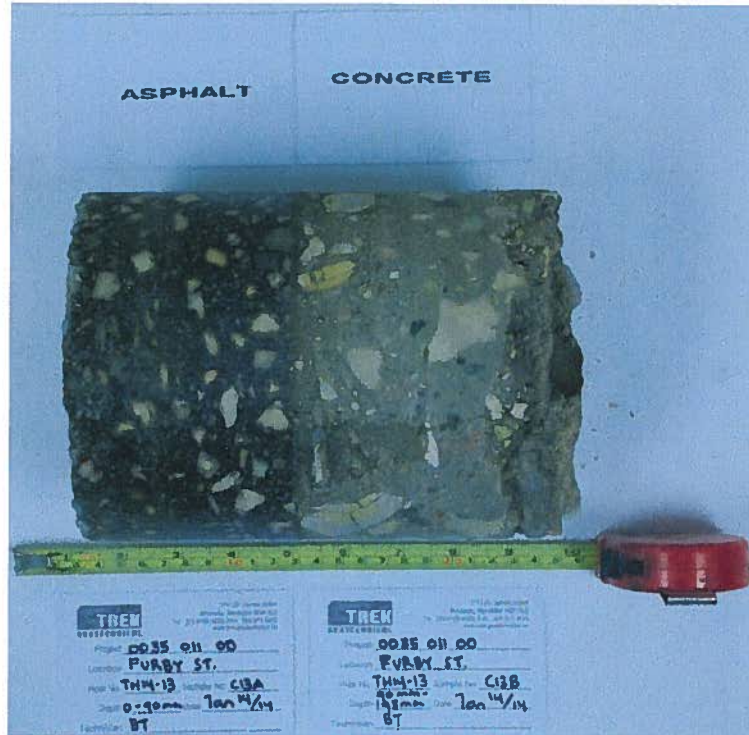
Asphalt and Concrete Core Sample from Test Hole TH14-13
